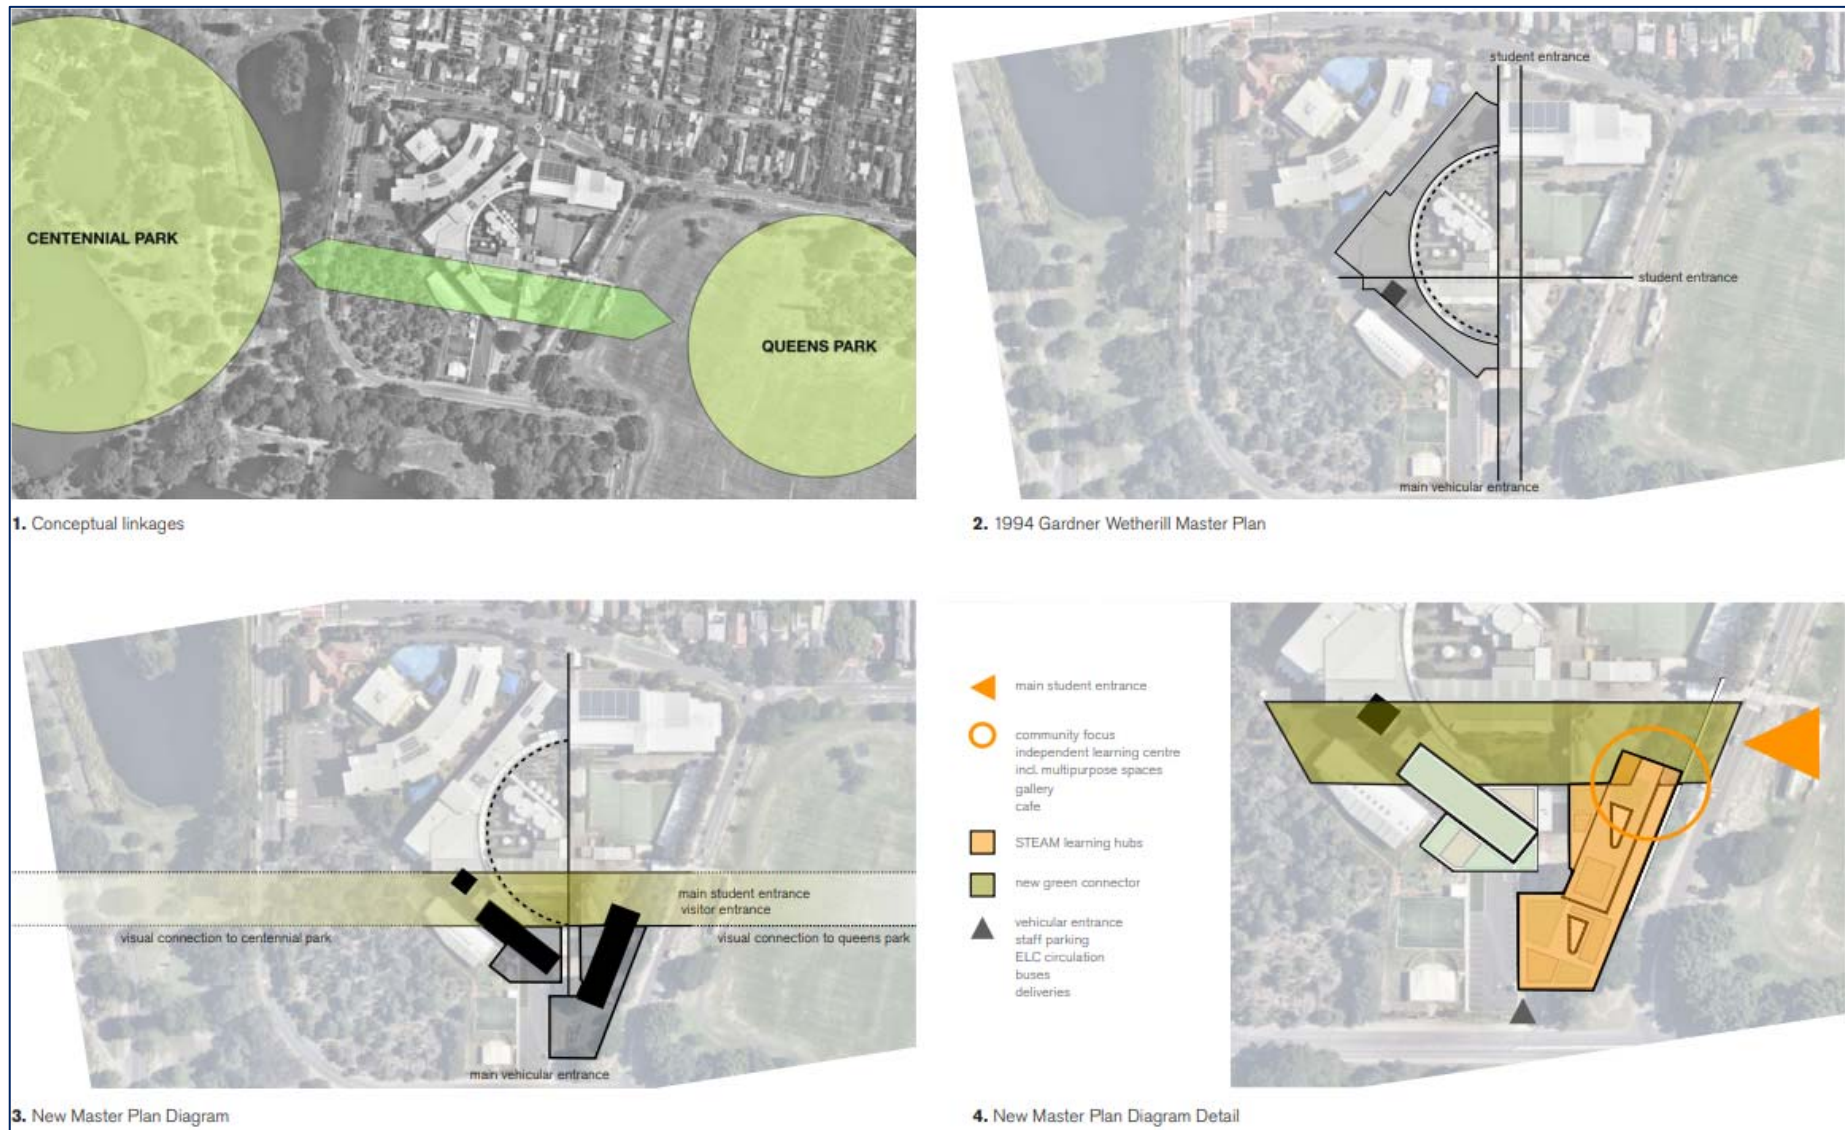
| Conceptual linkages and Green Connector under the proposed site master plan (Source: Applicant's RtS)
